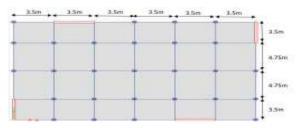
Elevation of building with 0.5% shear wall ration in each direction
